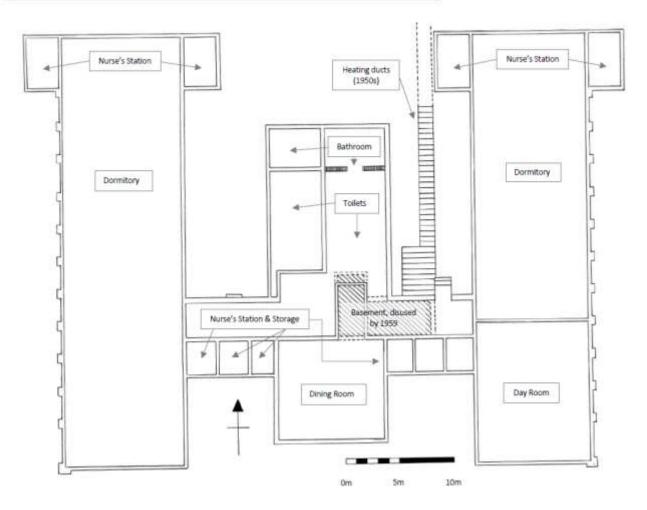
Area 2. Plan of Ashlin's building No 4 / Block 9 as excavated (2016)
